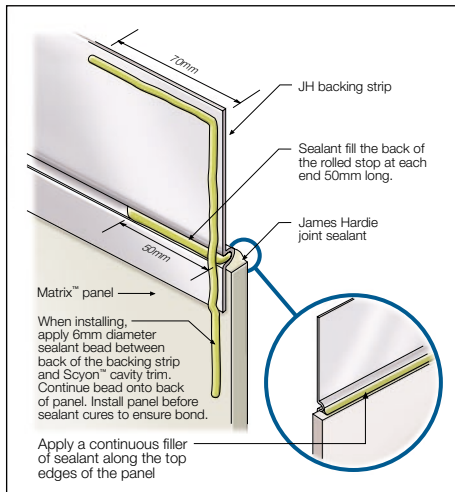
SEALING JH BACKING STRIP END DETAIL
